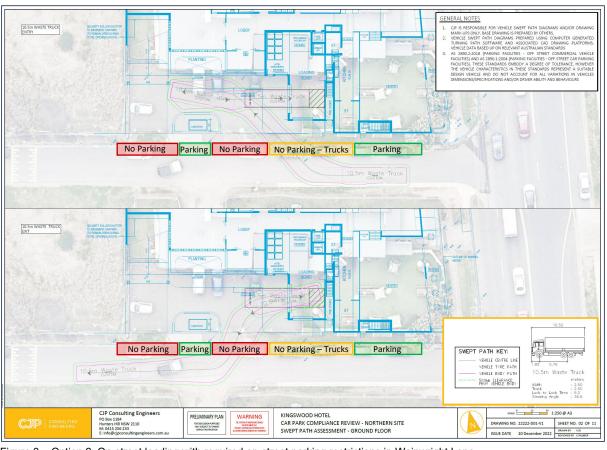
Option 2: On-street loading with required on-street parking restrictions in Wainwright Lane
